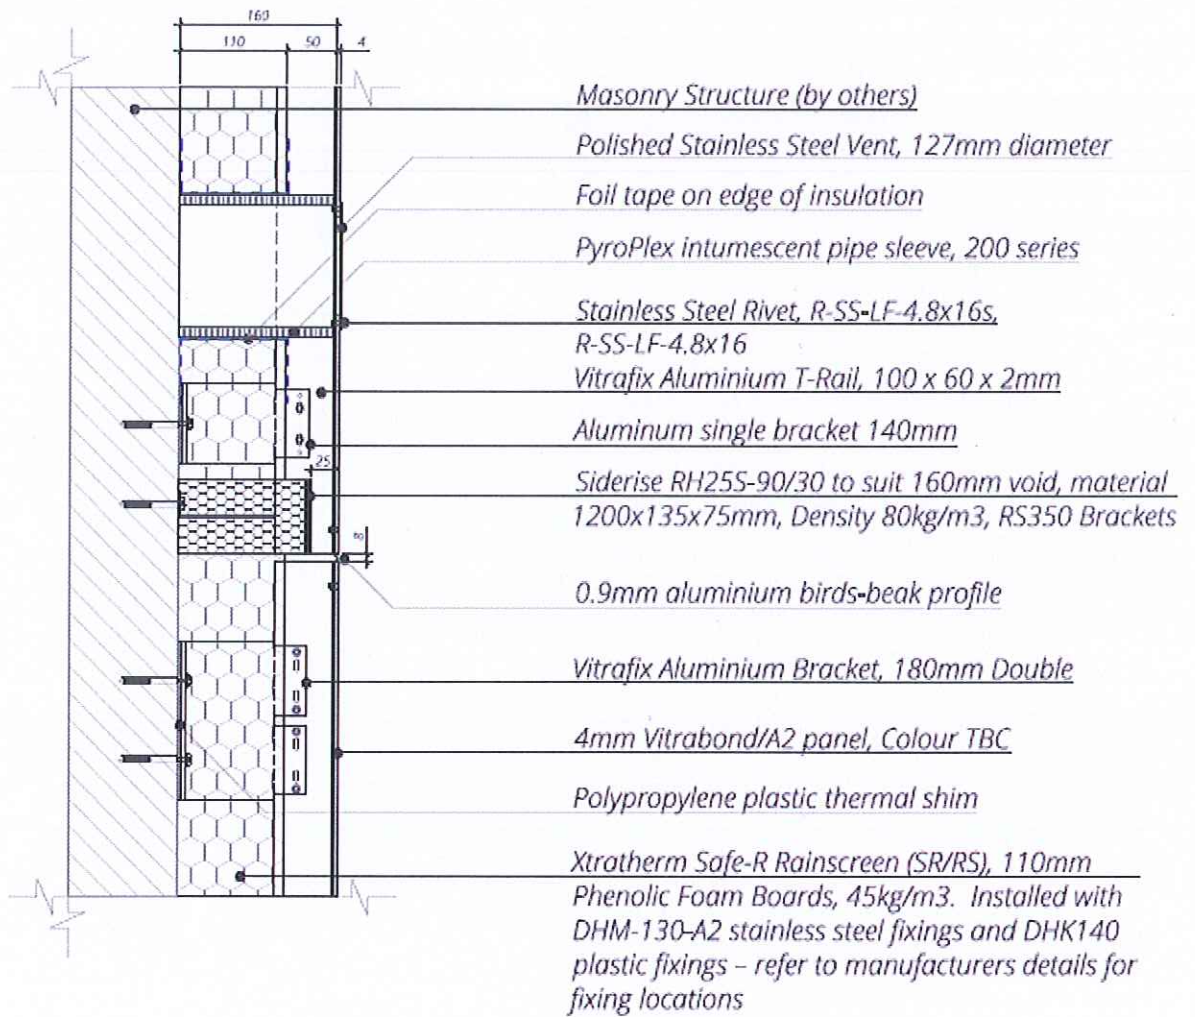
Detail of the system showing intumescent cavity barrier and ventilation
